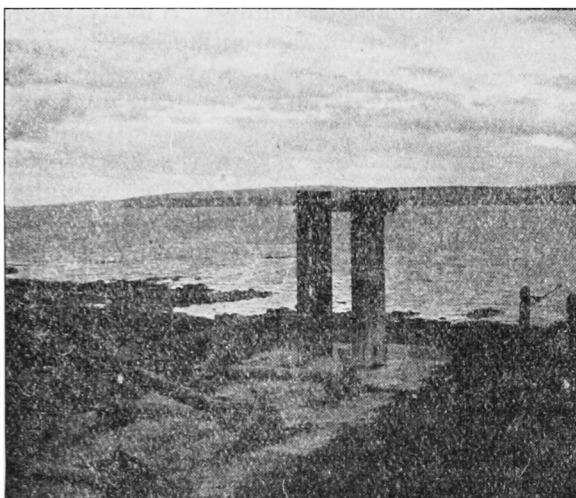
CONCRETE BLOCK, IN WHICH STAYS ARE FASTENED (DURING CONSTRUCTION).
